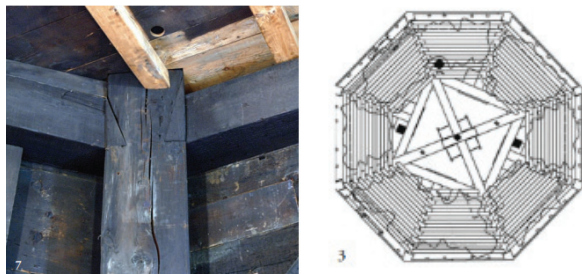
Timber joint and plan view of the Portland Observatory (1807) Munjoy Hill, U.S. [8]
